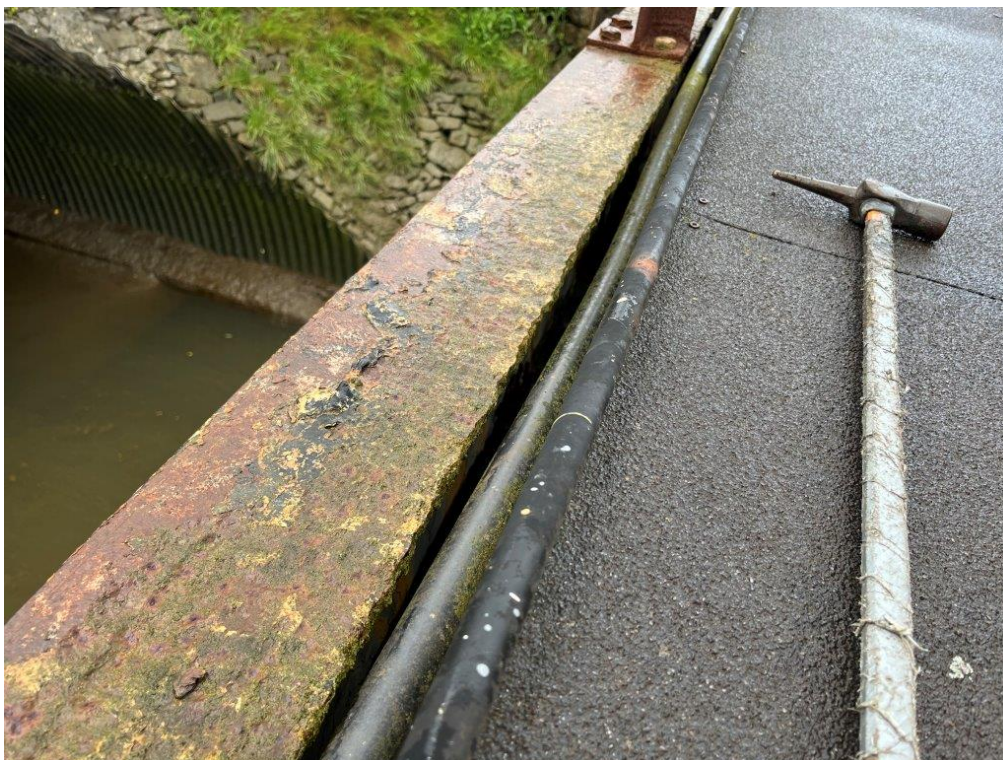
Top Flange of DS Walkway Support Girder (02/08/22)
